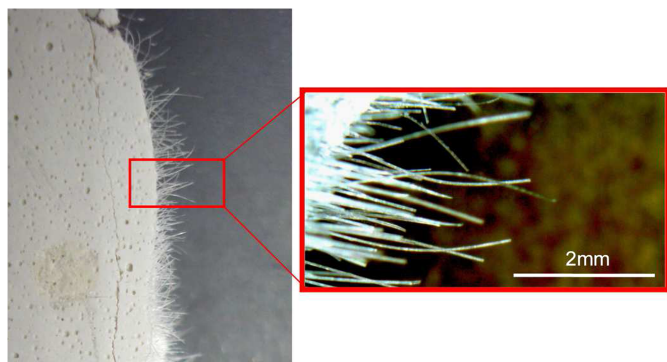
Microscopic observation of fracture surface of white ECC v1
